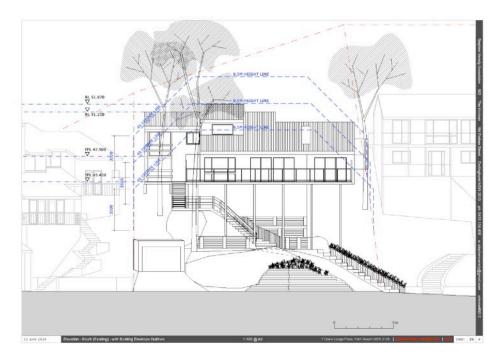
Existing Short Section Building Envelope Lines (Stephen Varady Associates)
